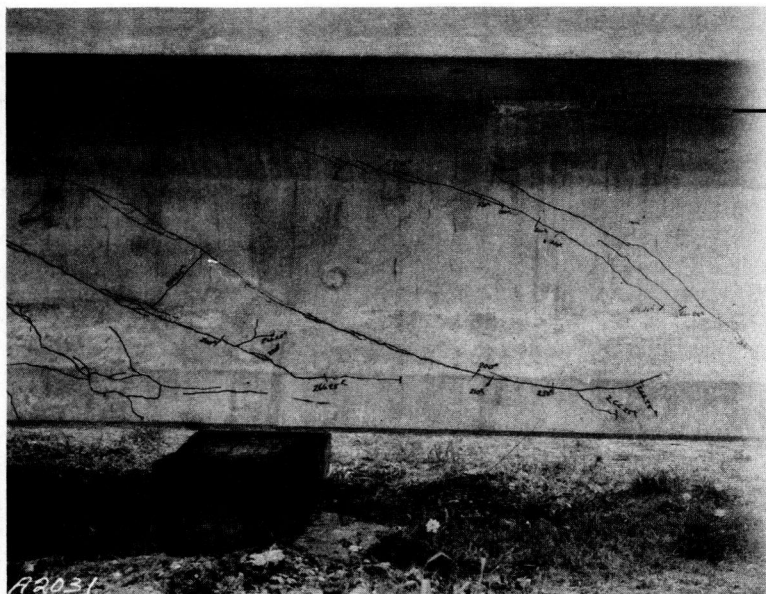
Cracking pattern, composite shear test, pretensioned beam.
